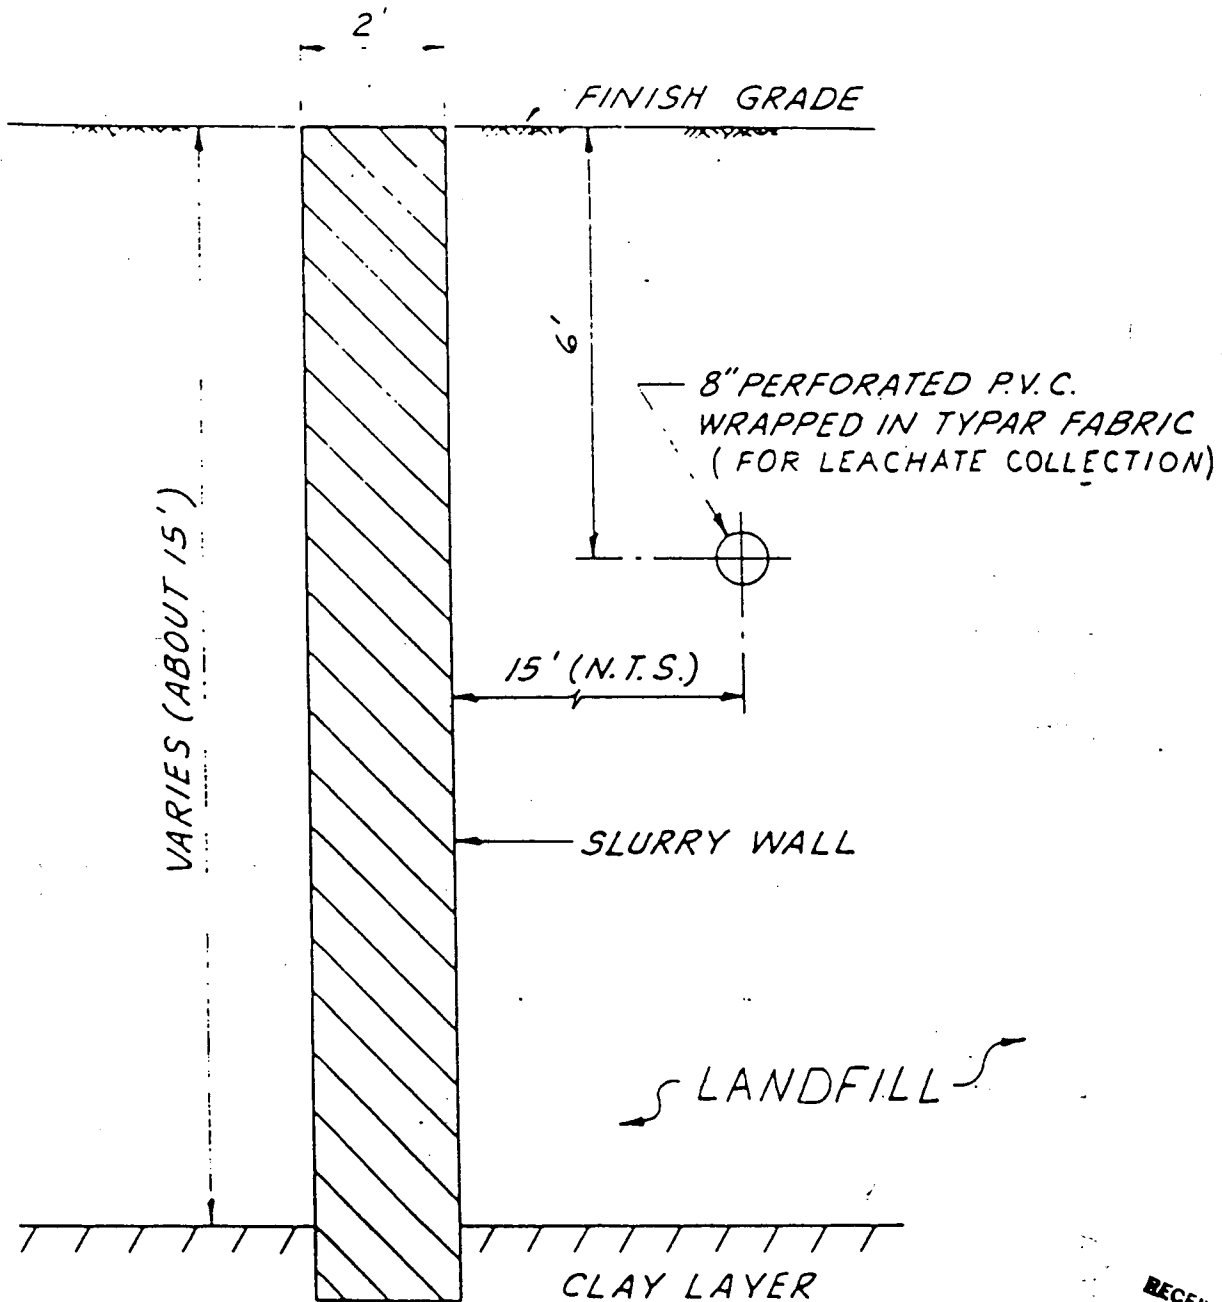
TYPICAL SECTION THROUGH EDGE OF LANDFILL SHOWING LEACHATE PUMP ARRANGEMENT
